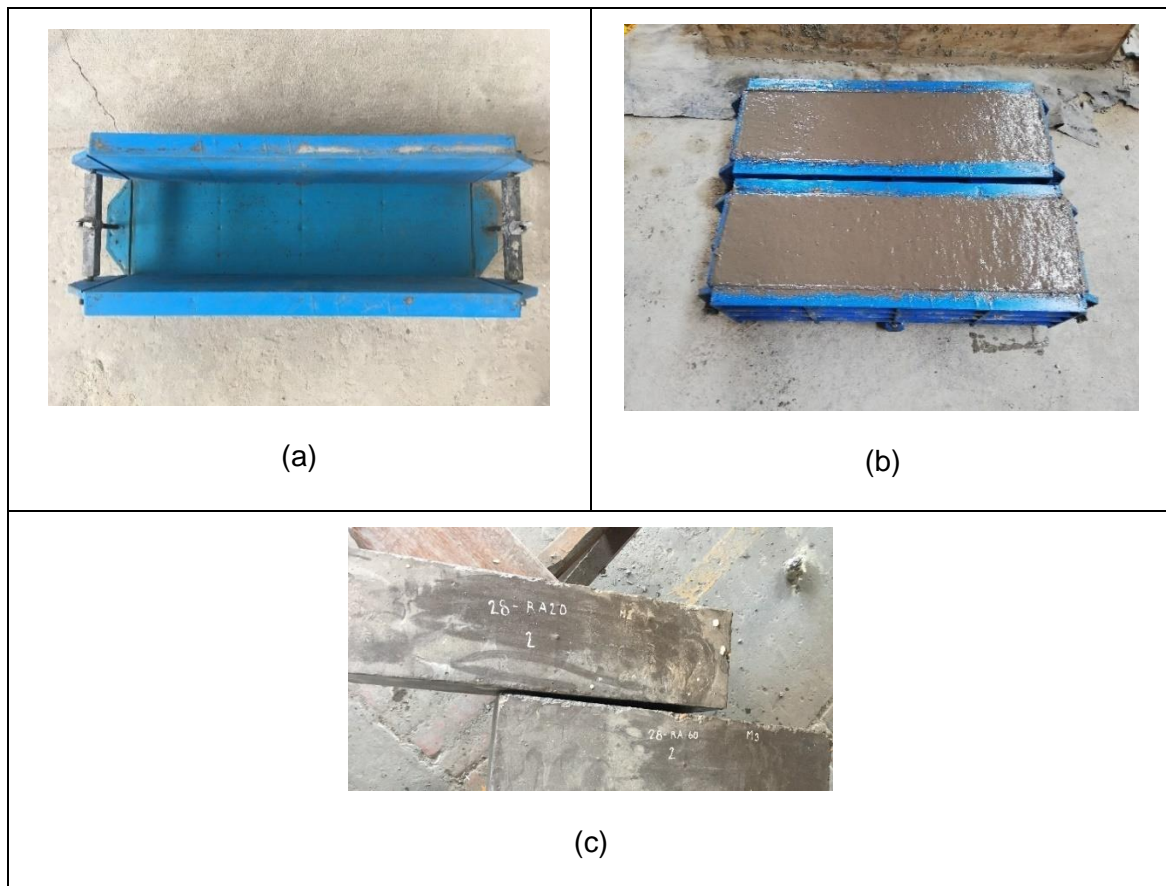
(a) Prism mold for concrete casting. (b) Molded specimens after concrete mixing. (c) Rectangular specimens after demolding.
